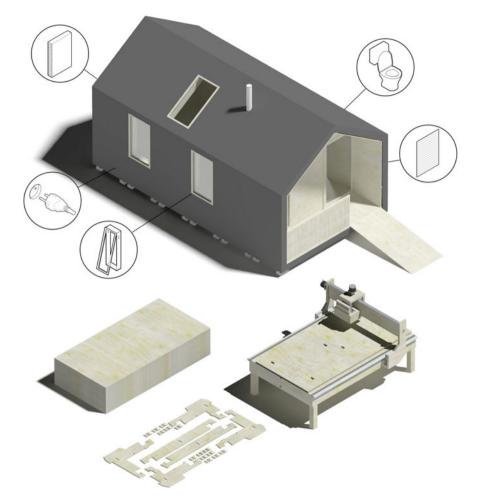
All the components can be quickly digitally designed and produced by a CNC machine (© WikiHouse)
